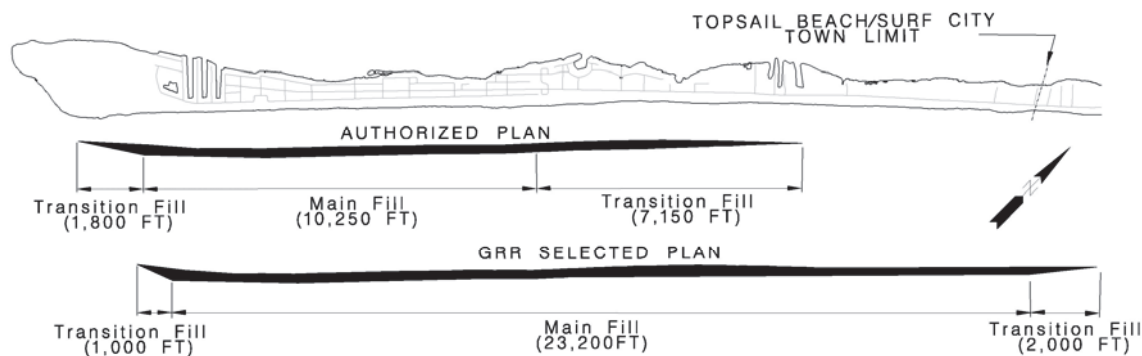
Authorized Plan (HD 393/102/2) and GRR Selected Plan, Plan view
